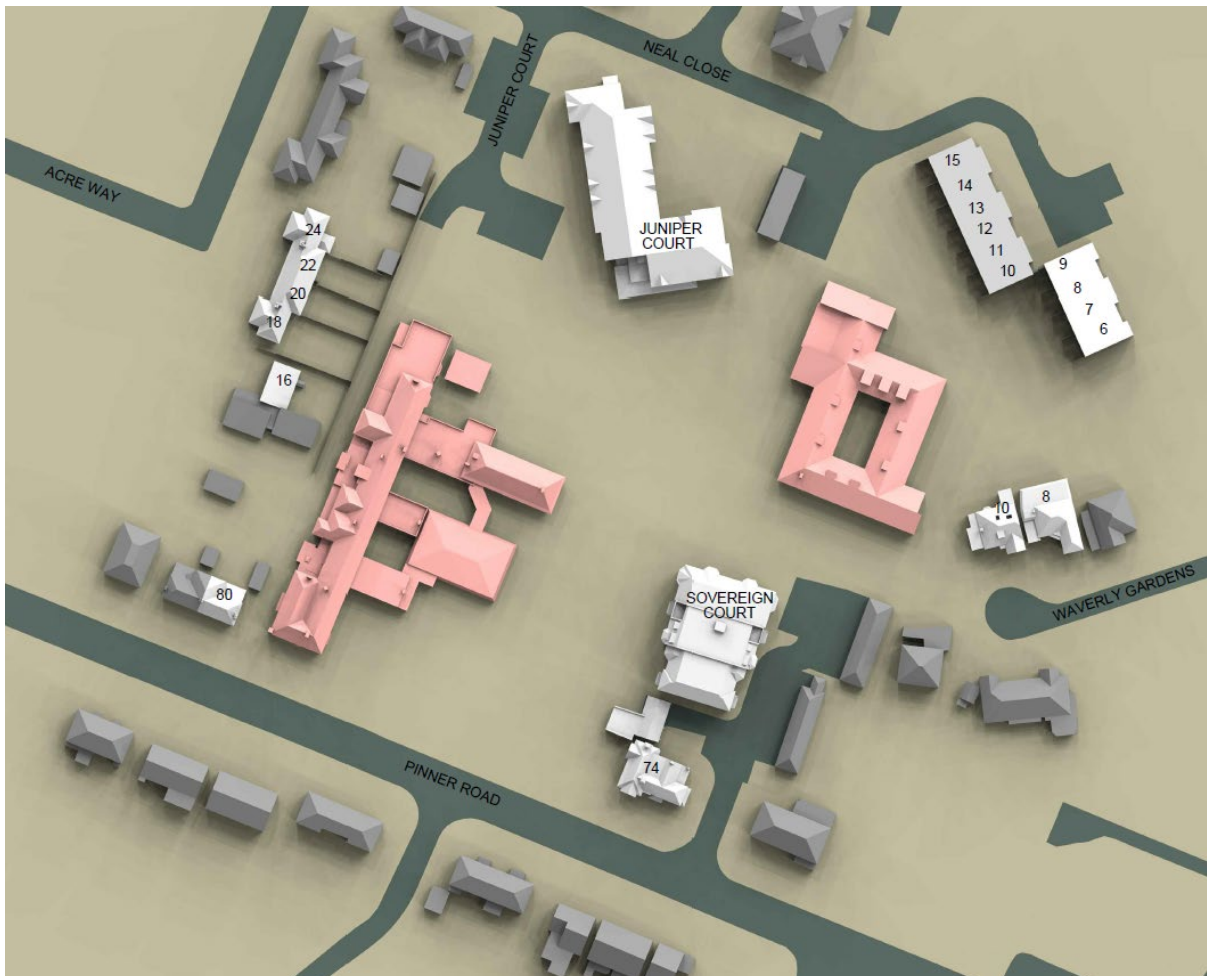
Site Plan (existing buildings shaded red) and Neighbouring Context
